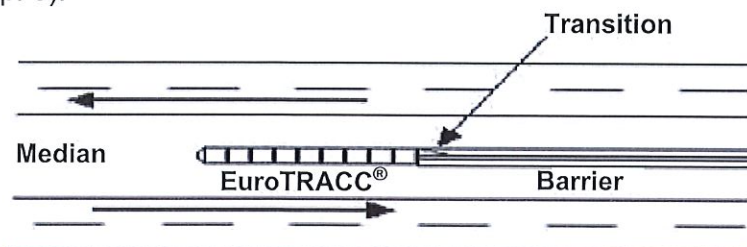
Bidirectional Traffic Flow – Requires Transition on One Side.
